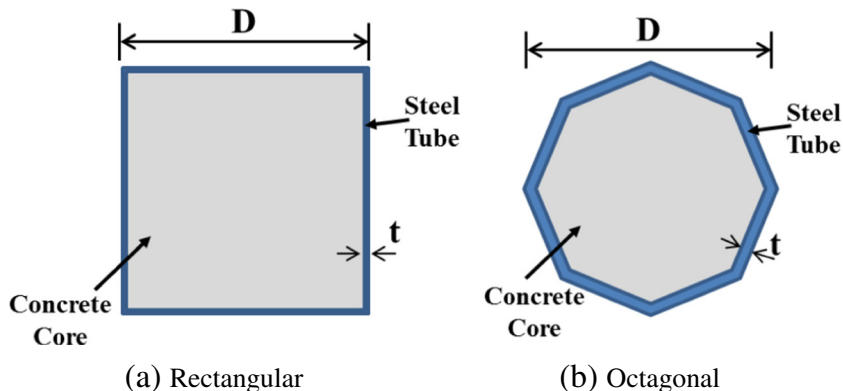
Concrete-filled-tubular (CFT) columns with large-size sections.
